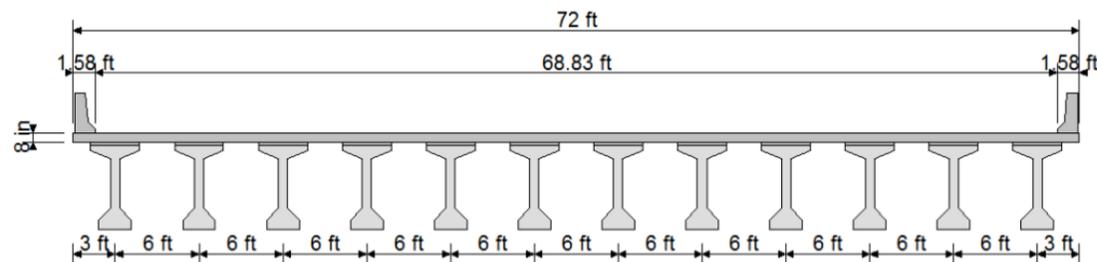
Bridges on HOV Lanes over Southern Ave. - Typical Section (AASHTO Type VI)
